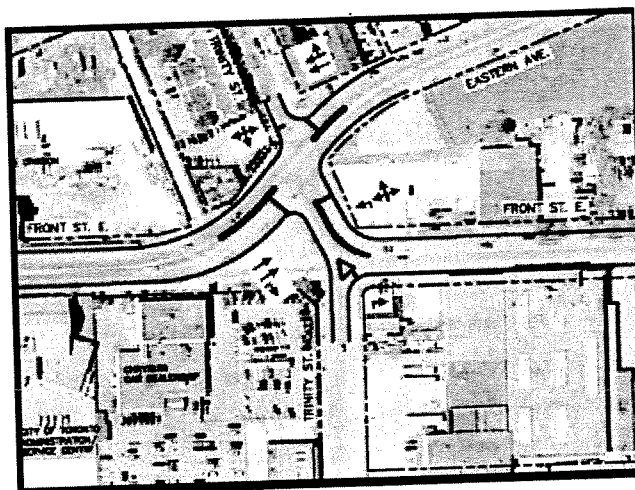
Alternative 2 realigns the intersection such that Front Street and Eastern Avenue form a single east-west road.
